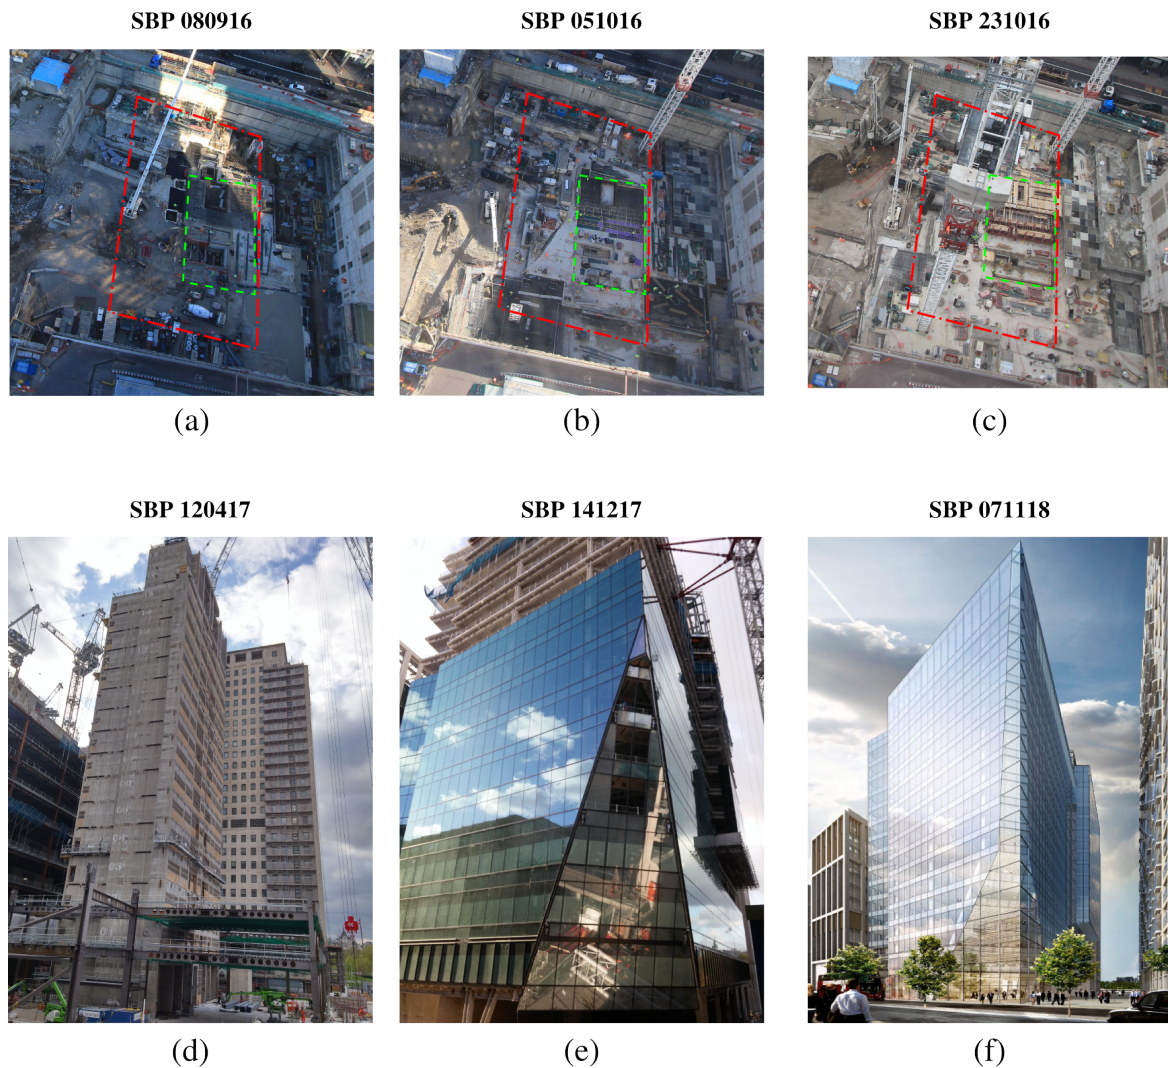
Site configuration, for the case study building, for each measurement session at different construction stages: (a) the stage preceding the addition of a concrete slab foundation over the footprint of the structural core (dashed green line) and that of the entire building (chained red line); (b) after the slab foundation has been cast in-situ and in preparation of the isolation of the structural core by means of a elastomeric mat; (c) after the construction of a floating, concrete slab over the footprint of the structural core; (d) after the construction of the 17-storey high structural core; (e) after the completion of the concrete-steel work of the structural columns and floors, and partial installation of the façade; (f) at the completion of the main structural work, including the installation of the façade, but still with flooring work ongoing in the unfurnished building.
